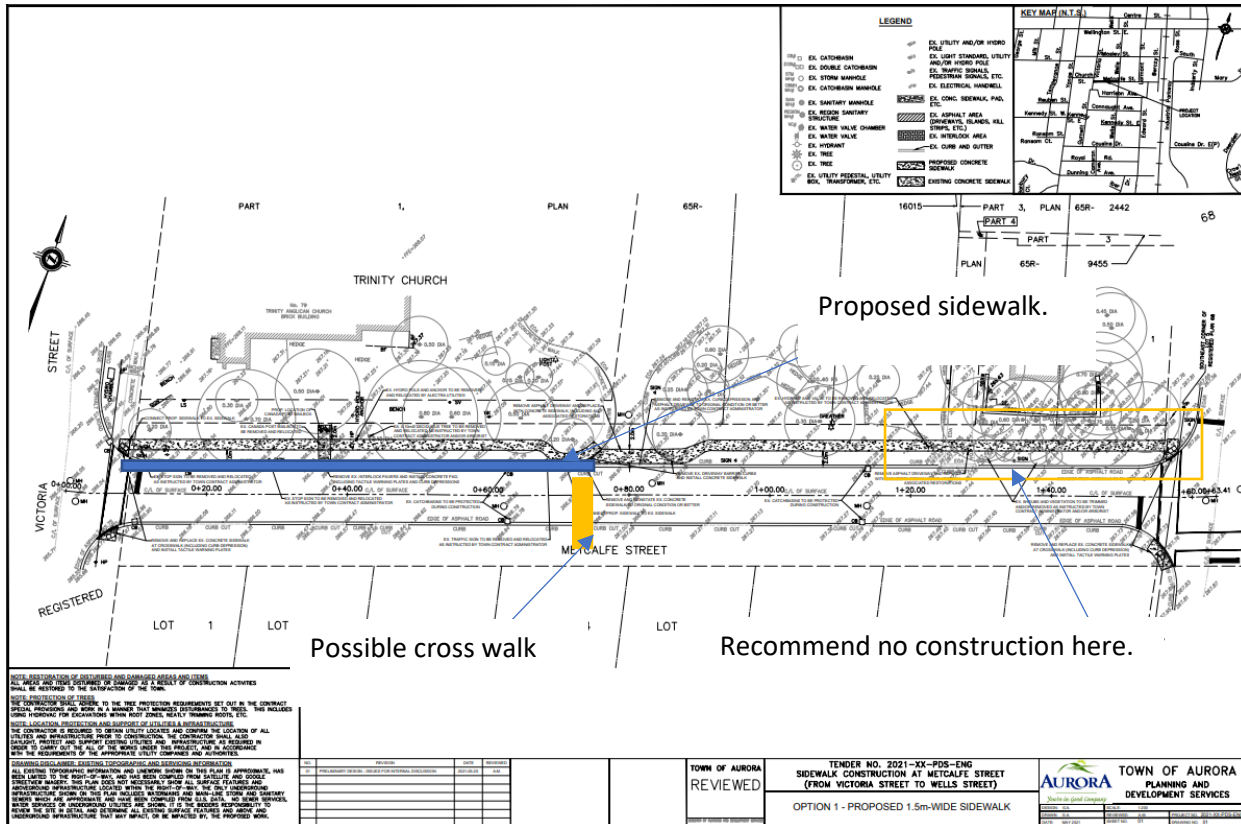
Shows the entrance to the church, this is where we would propose a access ramp and sidewalk towards Victoria street a well as a cross walk crossing the road.
